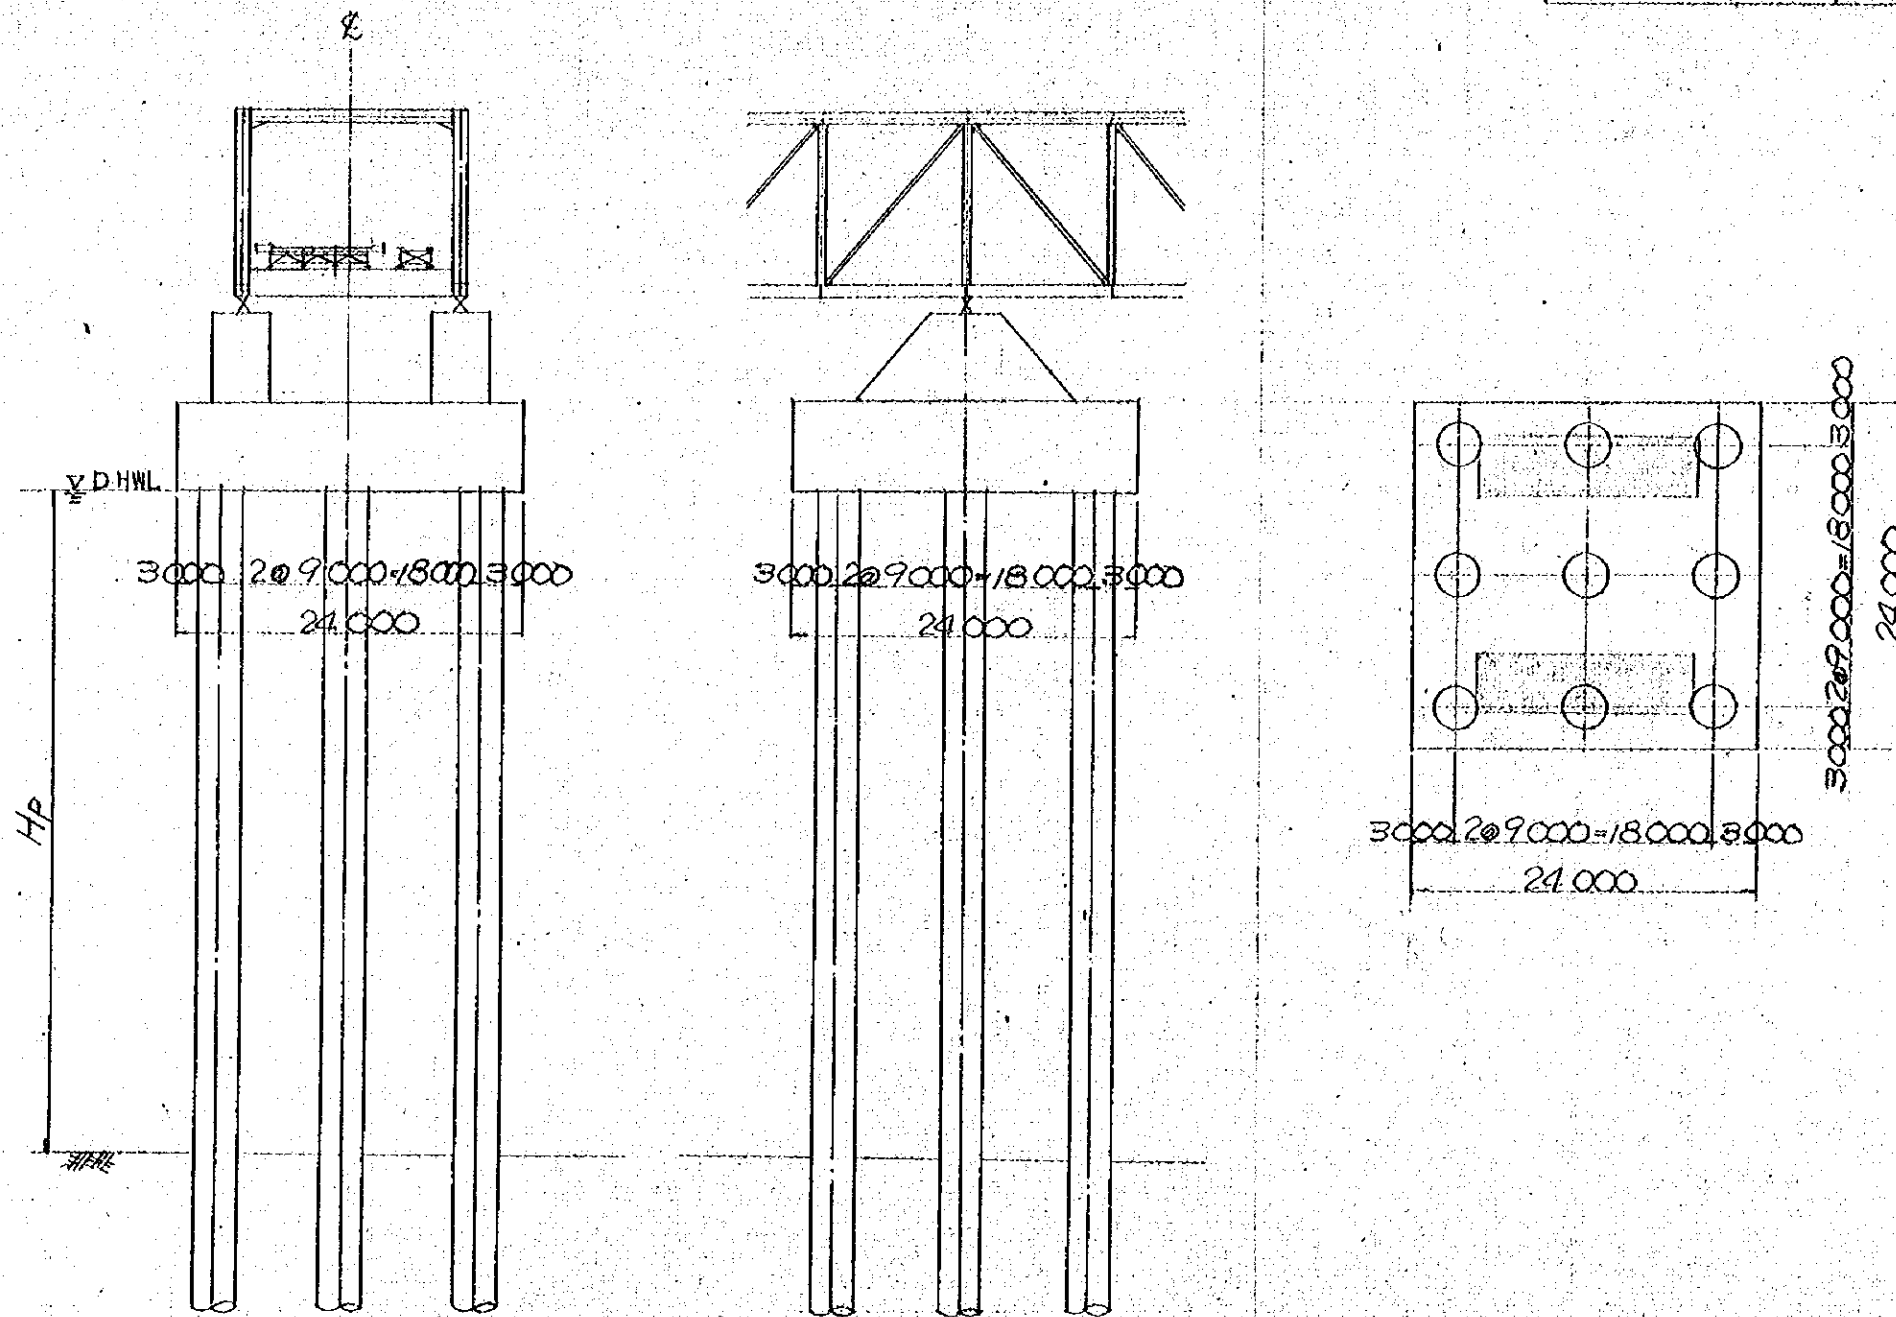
Outline of structure of multi-pile foundation.
